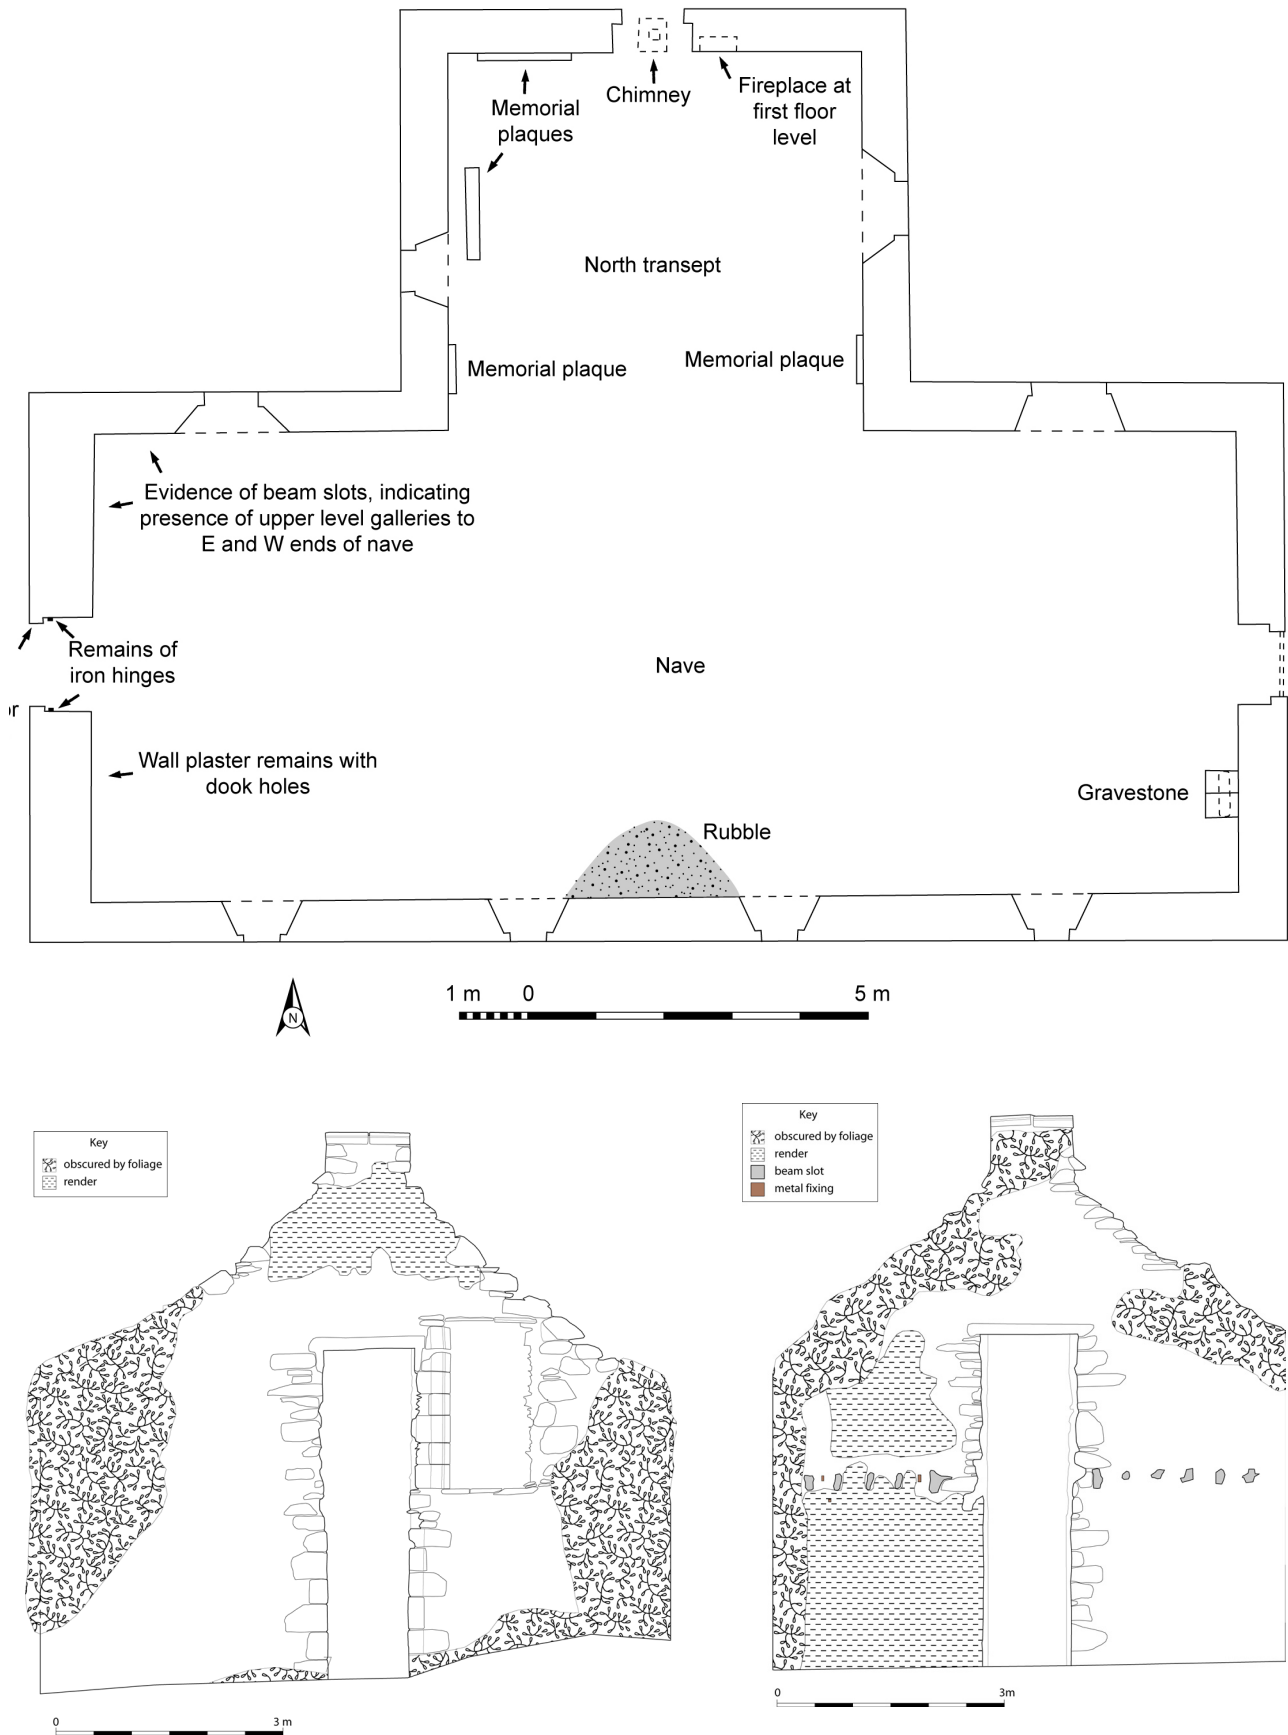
(Above) Plan of Sorbie Old Kirk; (below left) external W elevation; (below right) internal W elevation
